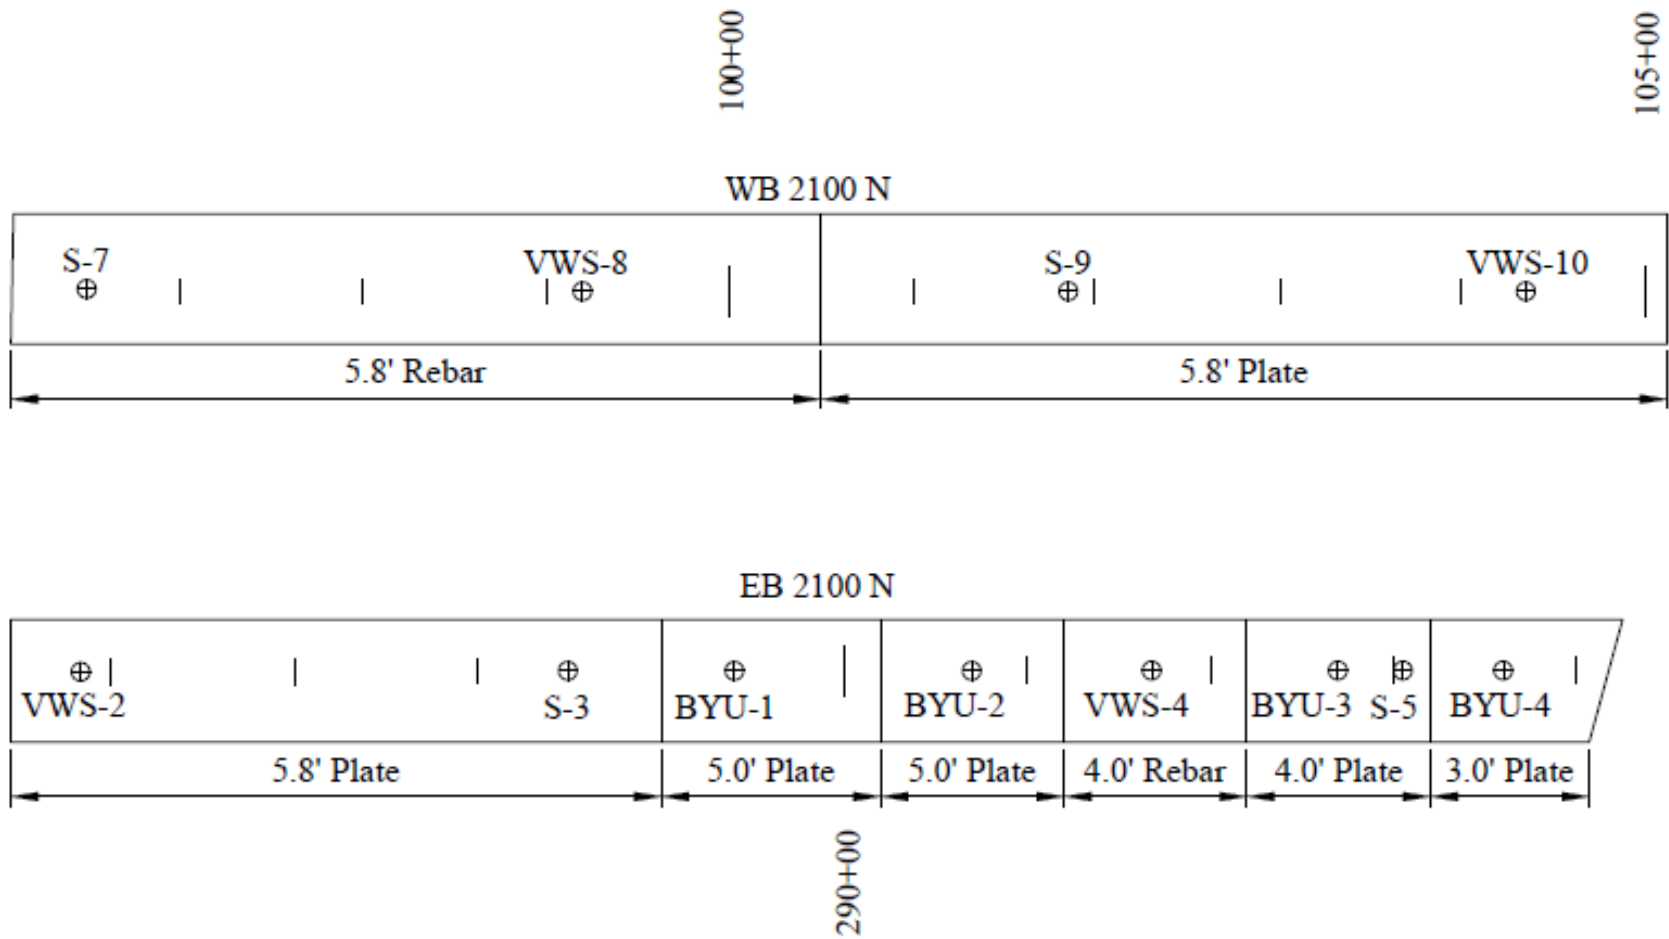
MVC Test Site Location with Spacings and Instrumentation
